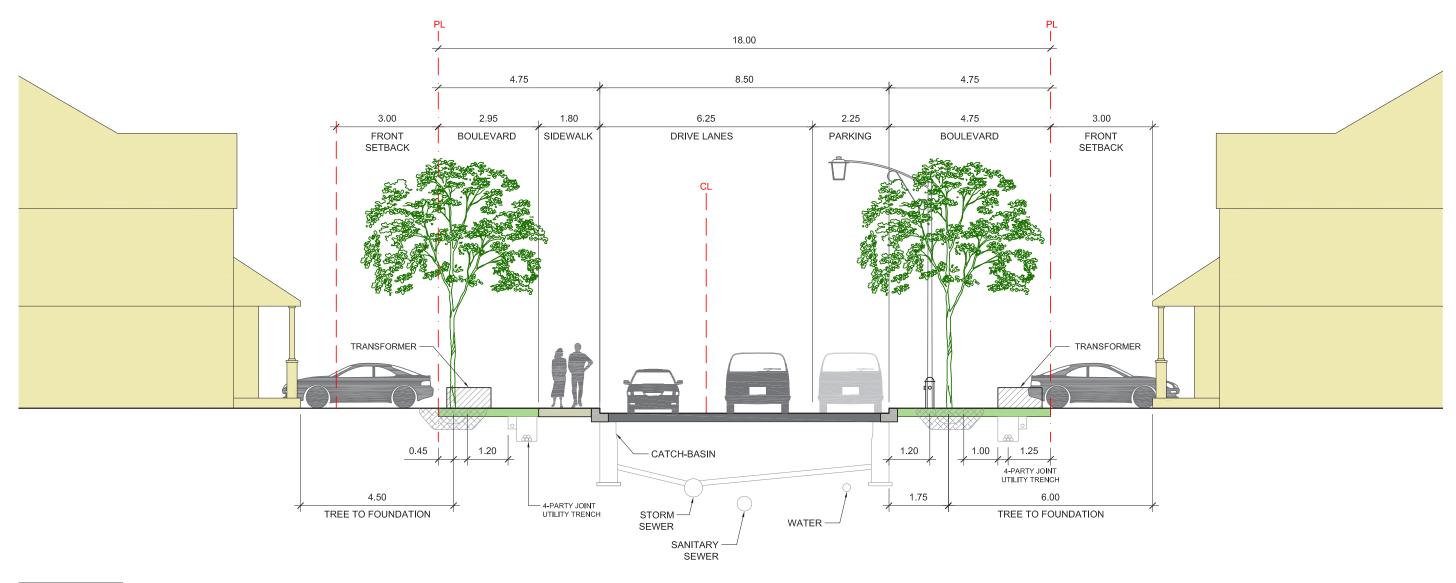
Local Road (Typical 18.0m ROW - Area 2)
